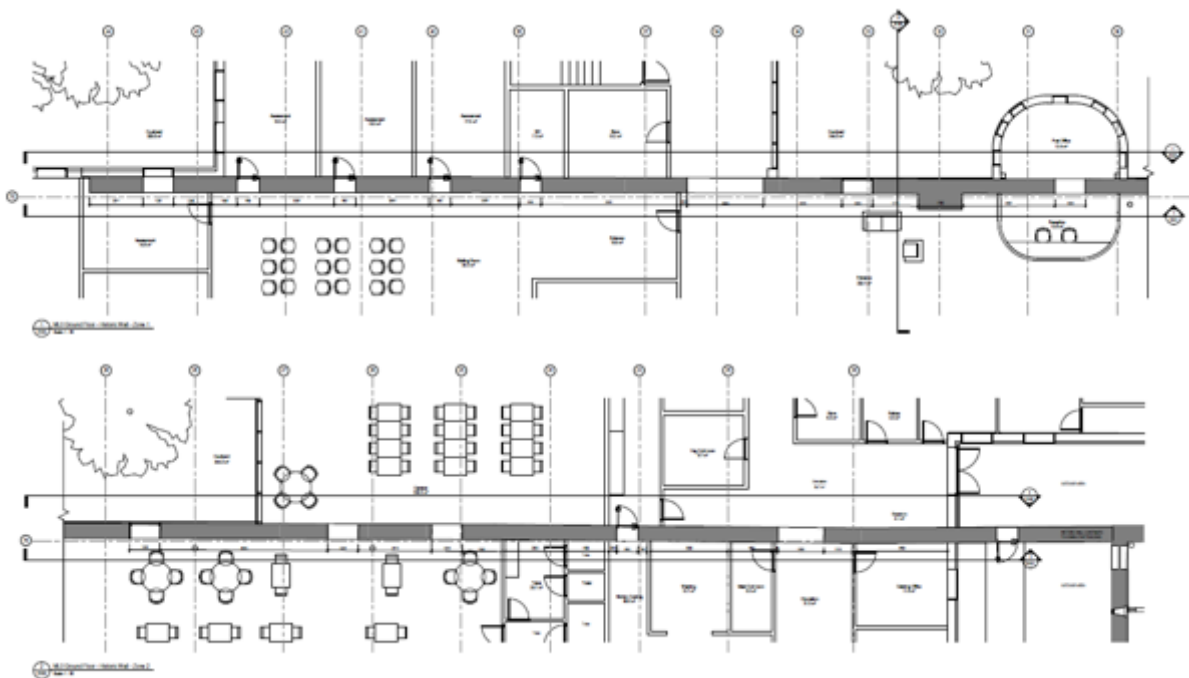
Proposed ground floor plan. Above: Part 1. Bottom: Part 2. Source: TOT Architects
